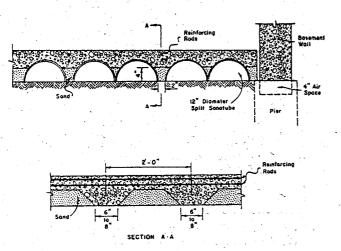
SLAB FOUNDATION WITH HONEYCOMB STRUCTURE
